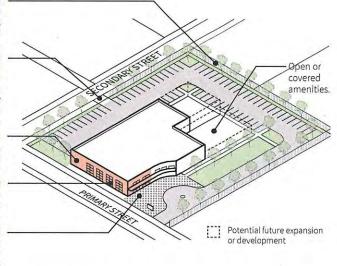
Entertainment center in outside General Plan Growth Areas - An entertainment center located outside General Plan Growth Areas that has a highly visible façade and direct access from the public realm that can double as a drop-off area. All parking is placed towards the side and rear of the site and is screened from public view using landscaping.
